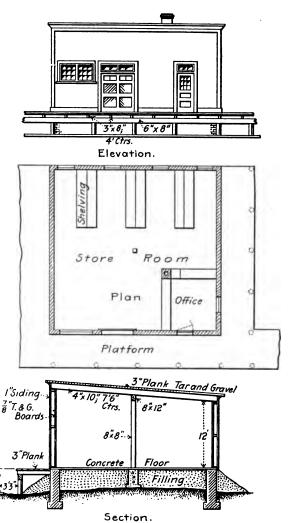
B.—Store House, Roadway Buildings. (After Orrock.)
